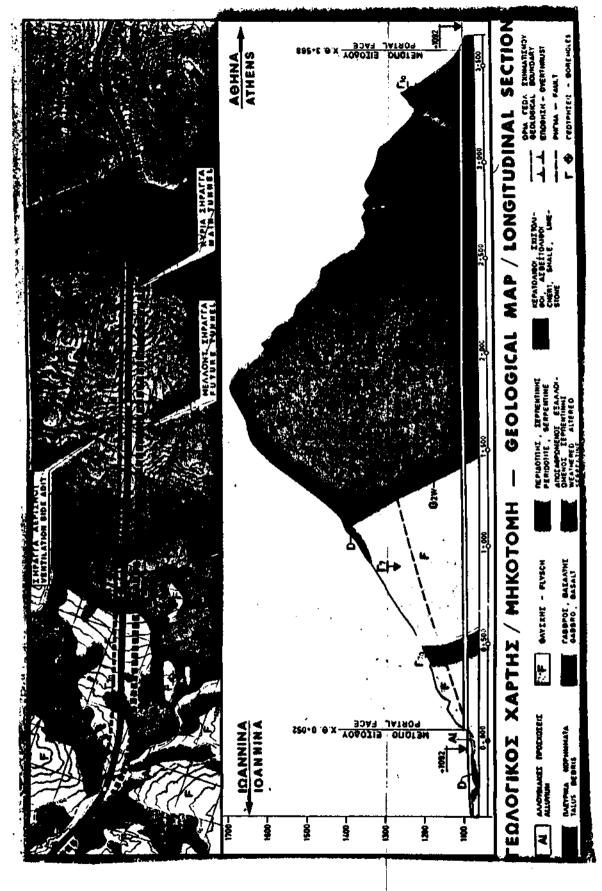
Plan view and longitudinal section of the Metsovo tunnel.
